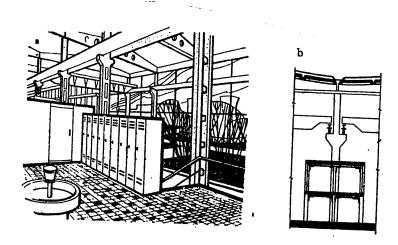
Built-in general services facilities a -- with the application of sanitary engineering cubicles; b -- the same outside the range of bridge cranes (under the crane tracks)
